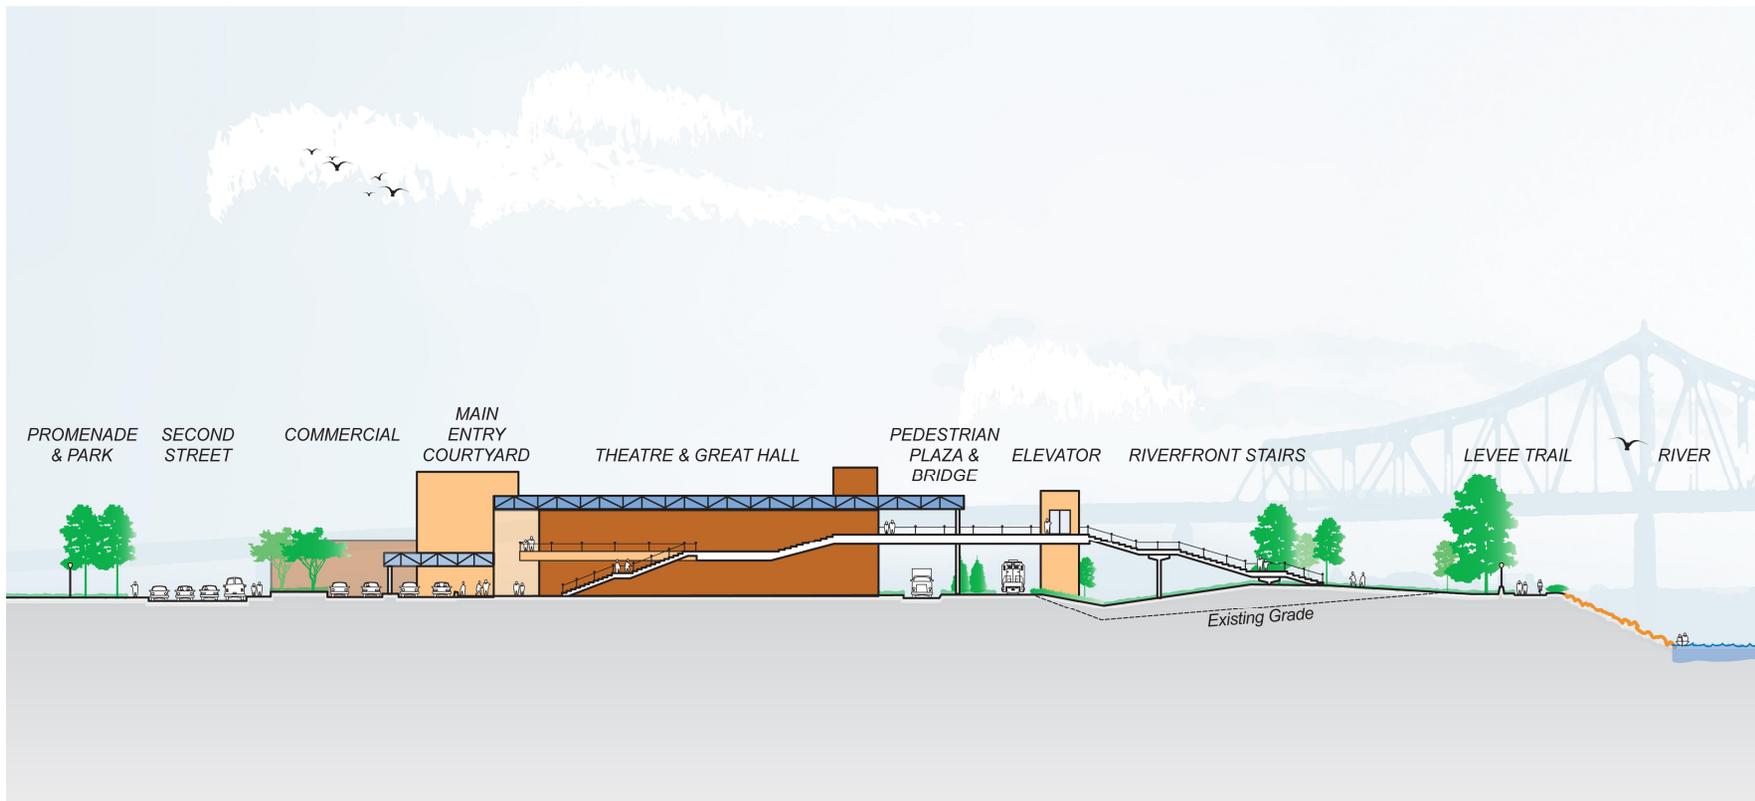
Trail cross-section C at proposed conference/performing arts center site east of Highway 43 bridge
